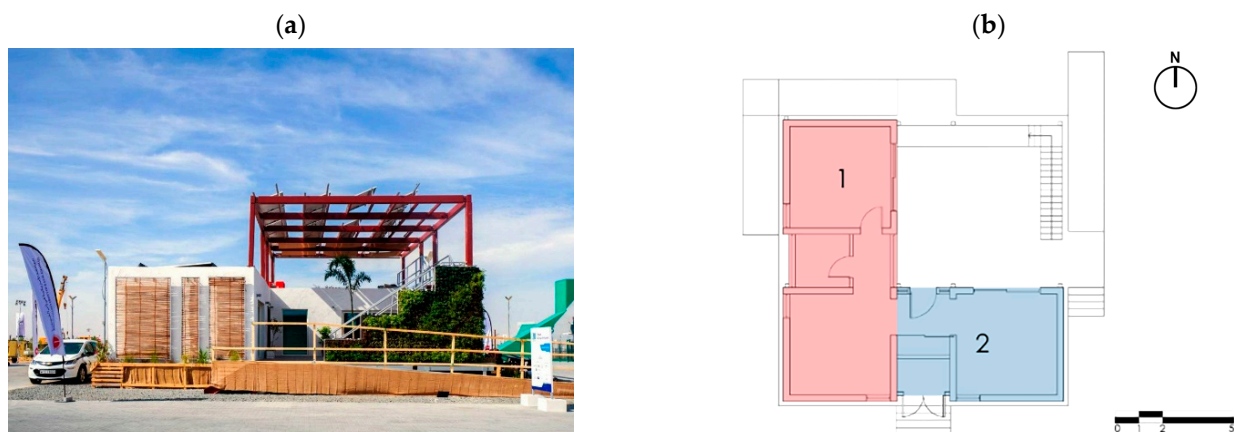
Team AURAK's house. (a) Exterior photo. (b) Floor plan—1: bedroom, bathroom, kitchen, dining area; 2: entrance, living room, electrical closet, mechanical room. (Photo: SDME 2018 Organization. Floor plan: by authors based on team AURAK drawings).
